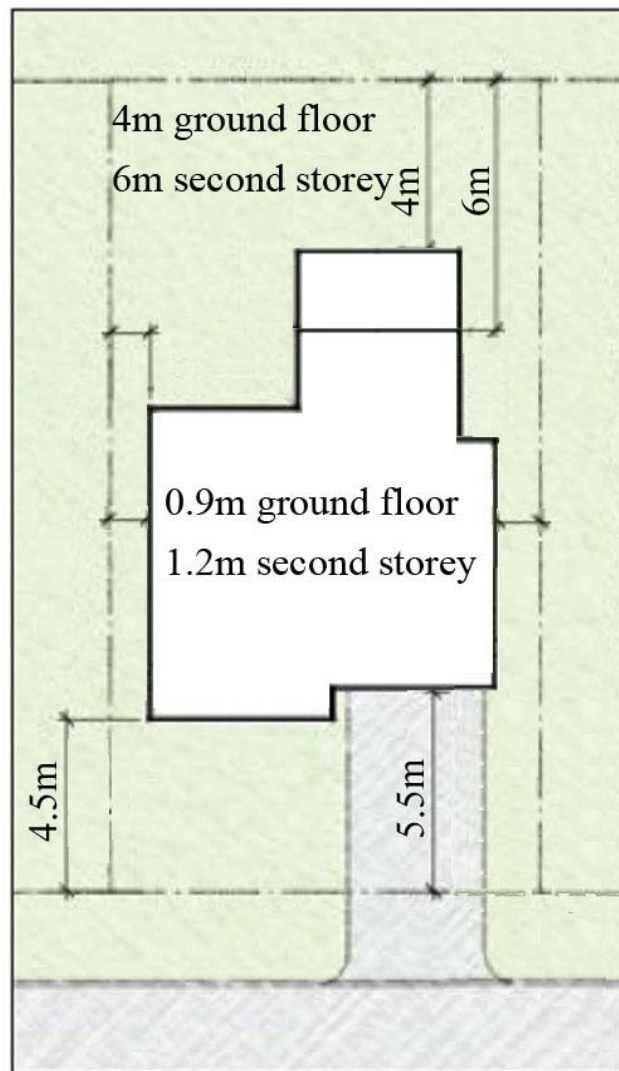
Example of Ground Floor & Second Storey Minimum Setbacks
